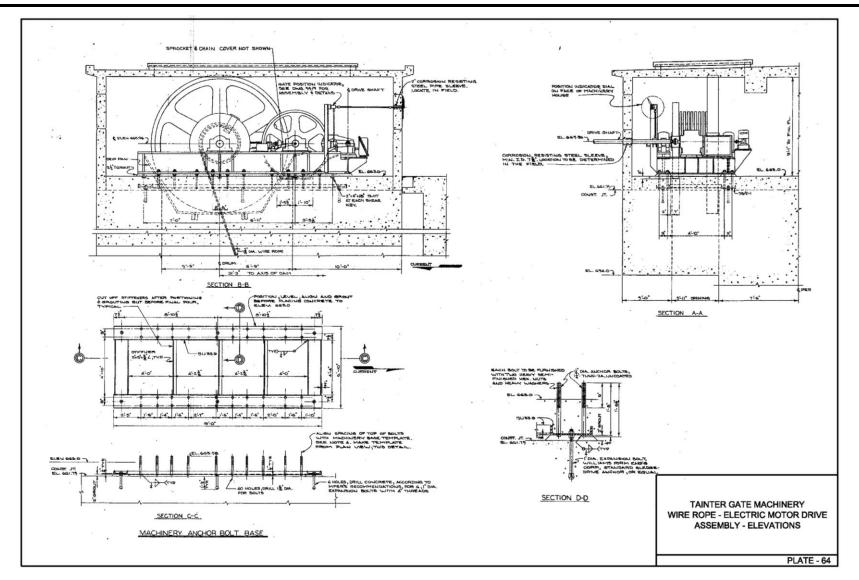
Plate 64: Tainter gate machinery, wire rope-electric motor drive, assembly – elevations
